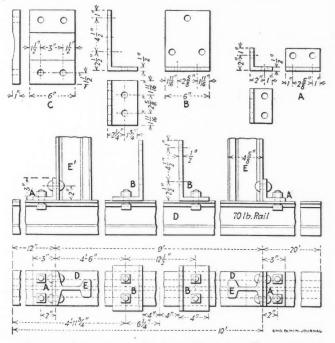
DETAILS OF STATION SUPPORT FASTENINGS
